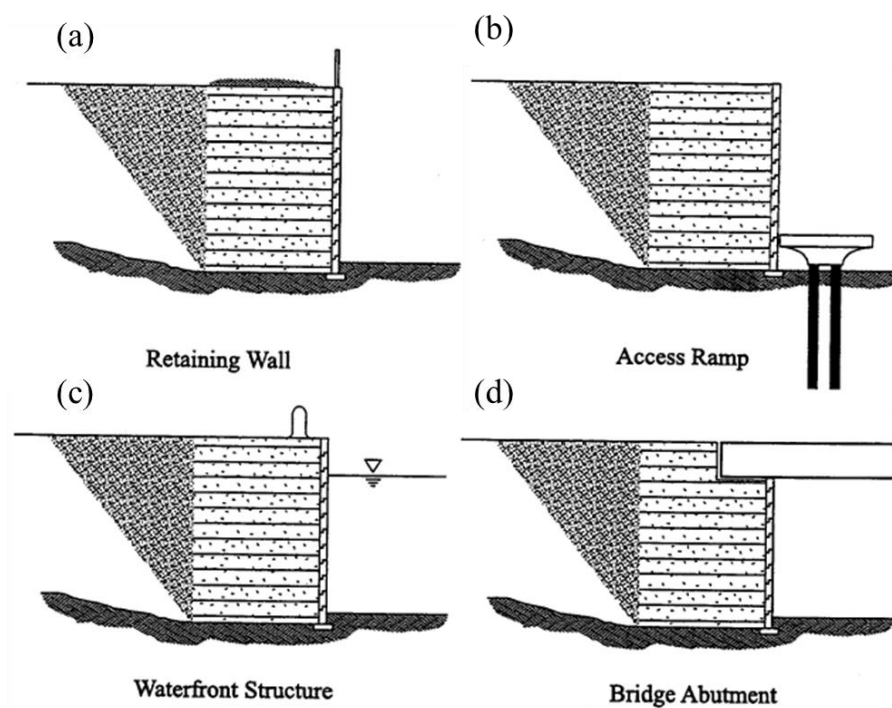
Representation of MSE wall applications as (a) retaining wall, (b) access ramp, (c) waterfront structure and (d) bridge abutment. (Berg et al. 2009)
